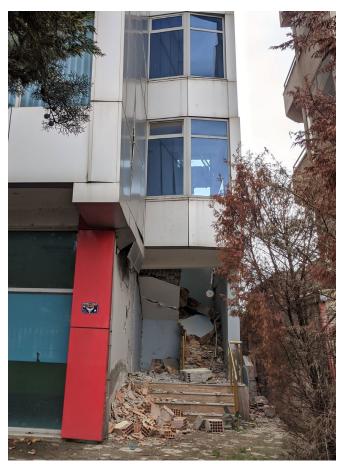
Masonry infill debris blocking stairs (source: McKenney, 2019; Nikolić-Brzev et al., 2020).^{7,8}
